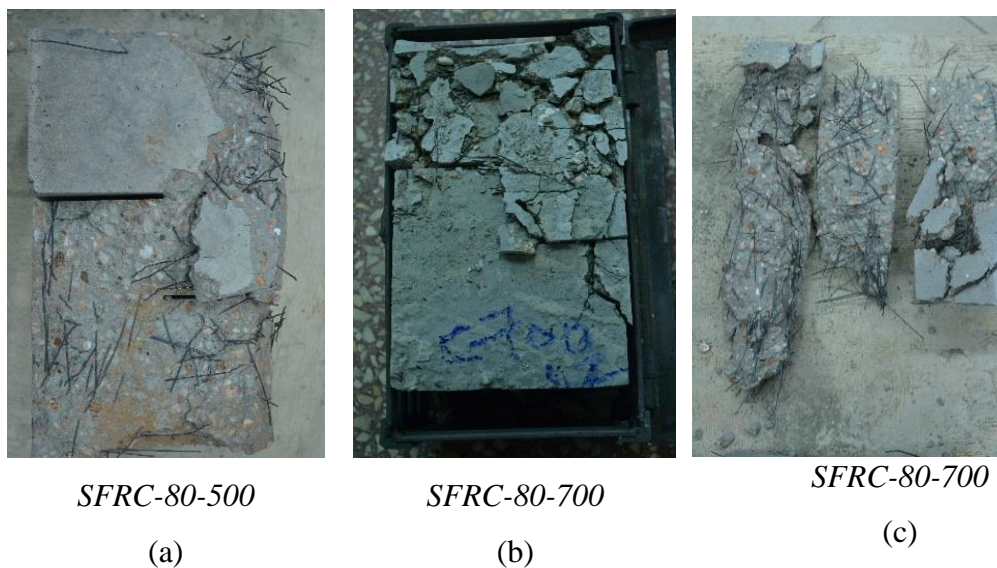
Total spalling: (a) spalling for SFRC-80-500, (b) spalling for SFRC-80-700, and (c) spalling for prisms of SFRC-80-700
